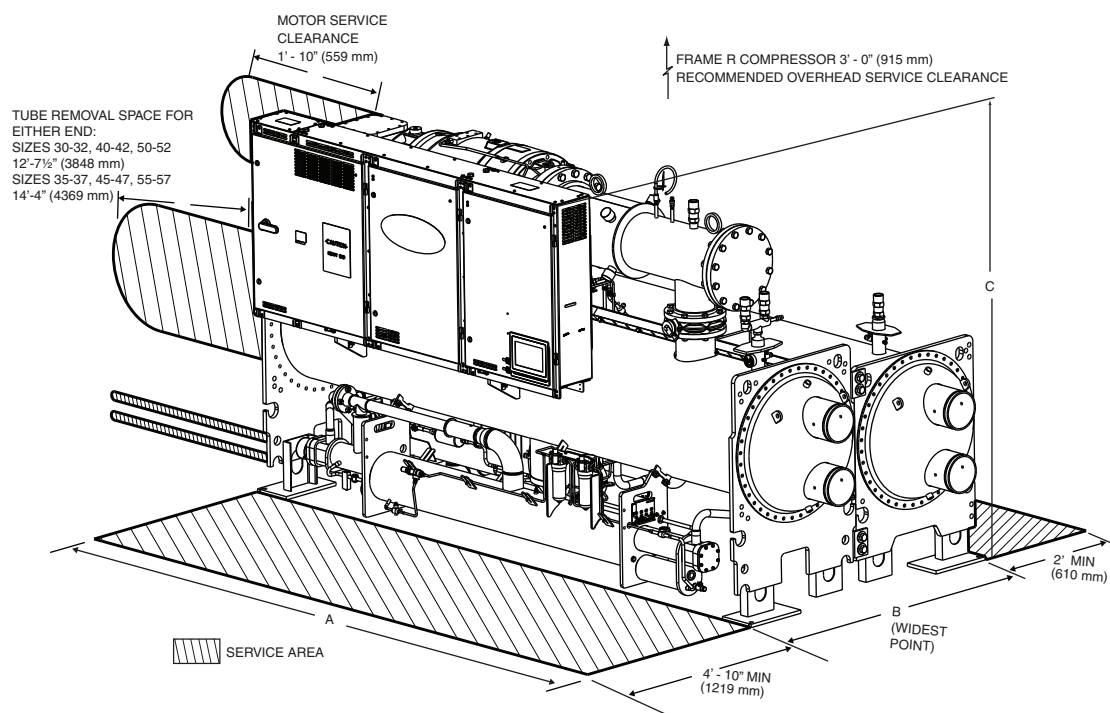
23XRV Heat Exchanger Sizes 30-57 Dimensions (Unit with R Compressor Shown)
